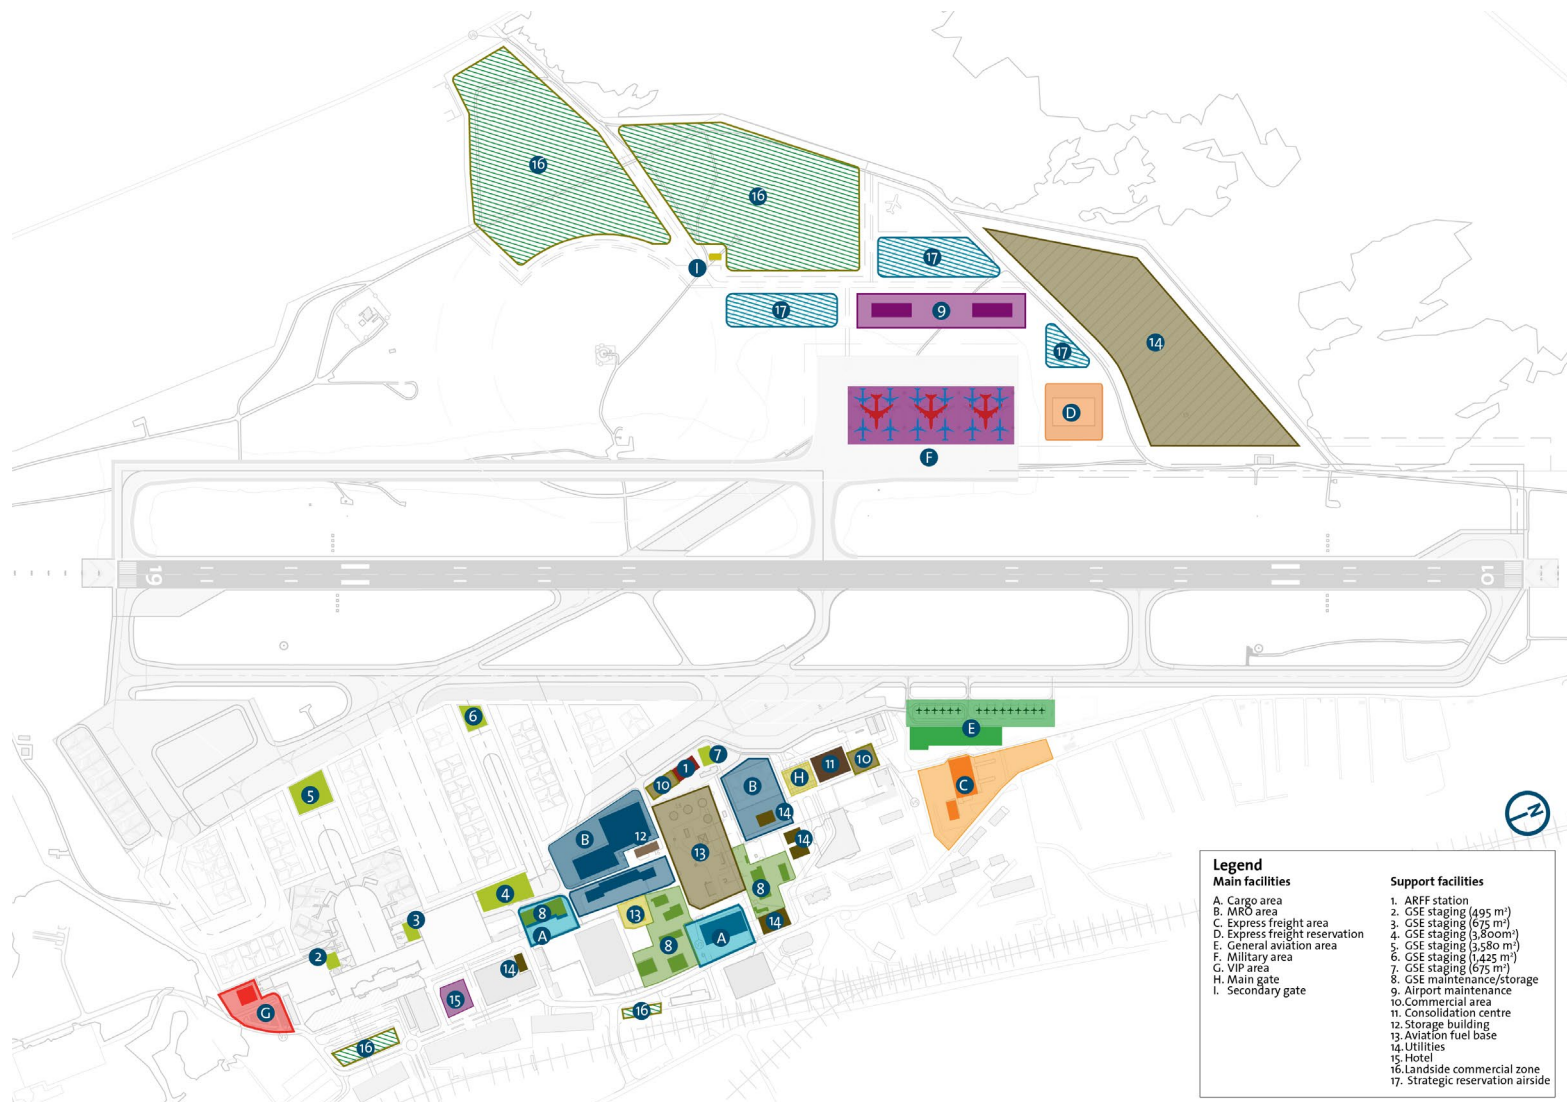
MAIN AND SUPPORT FACILITIES IN THE MASTER PLAN
